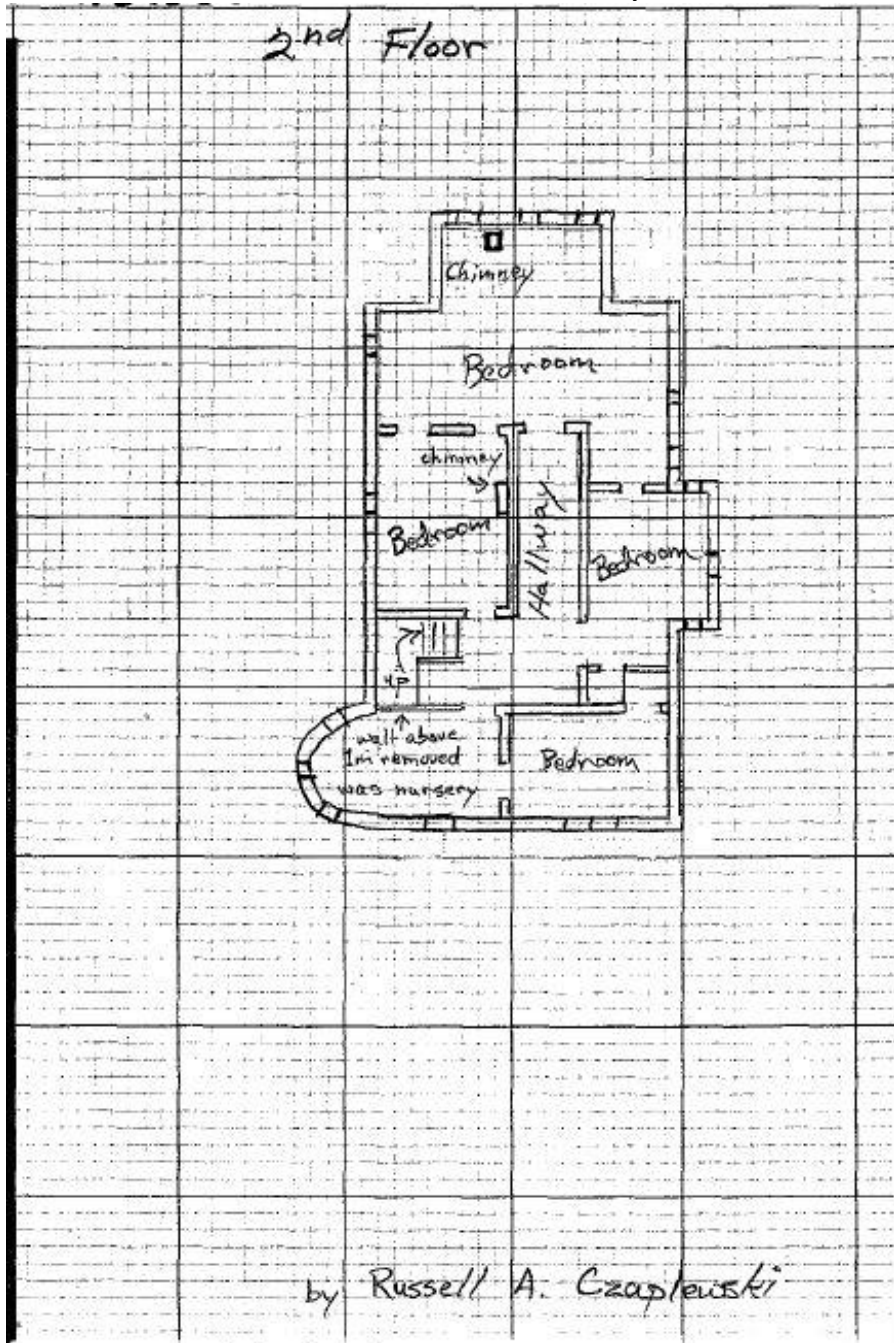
Harry V. Temple House, Floor plan, second floor, prepared by Russell A. Czaplewski, 1985 (NeSHPO Site Files, DS07-021)
